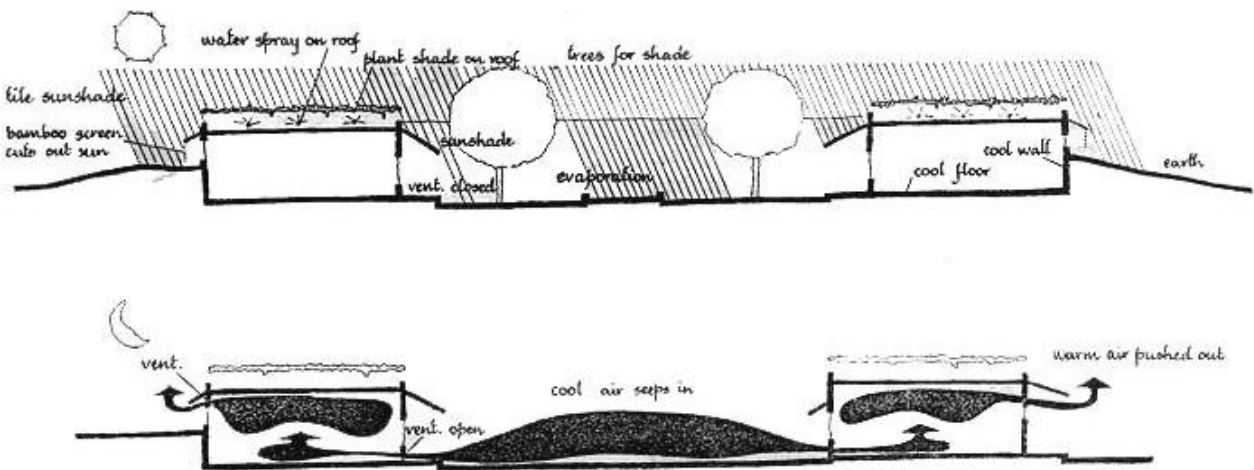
Sections through the building module. Roofs have been provided with a plant shade
